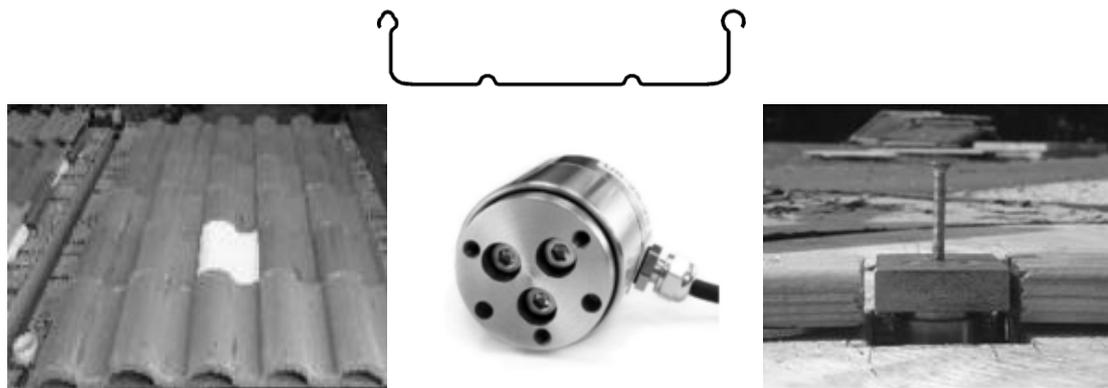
Joints Sheet Shape of Typical Aluminum Alloy Roofing
